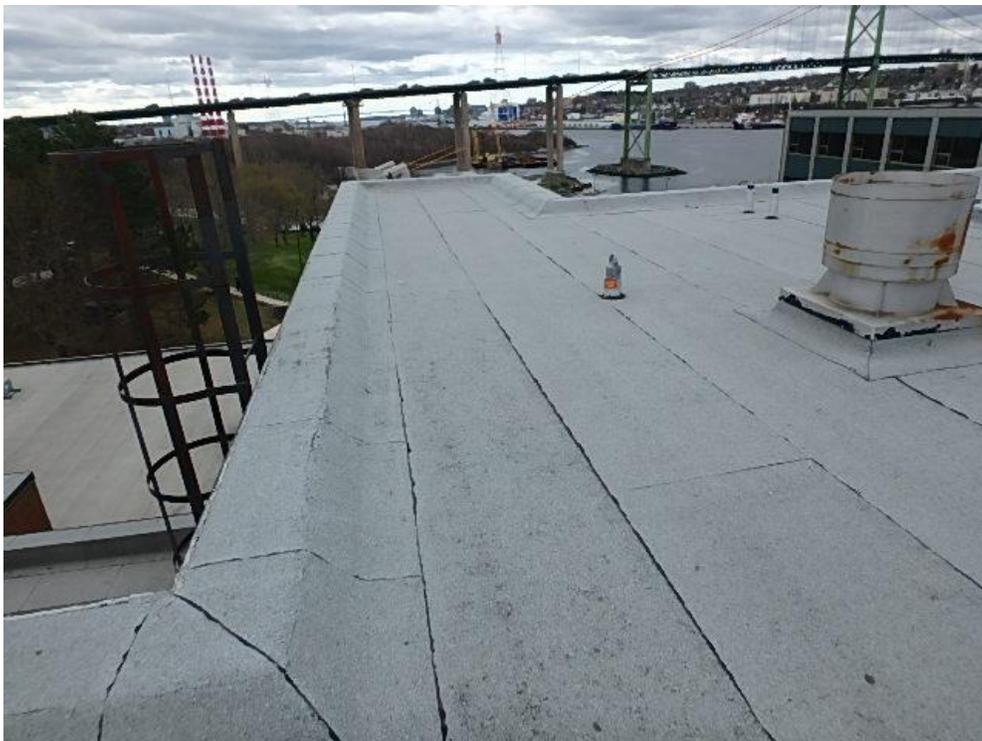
Roof Area 3.2 – Evidence of ponding around exhaust fan curb. Membrane flashing problems also evident around curb.
